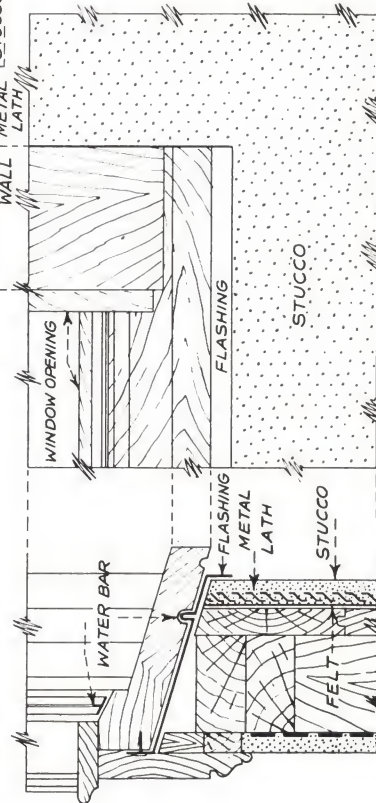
FLASHING WINDOW SILL ON METAL LATH AND STUCCO WALL - SCALE 1 1/2" = 1'-0"
